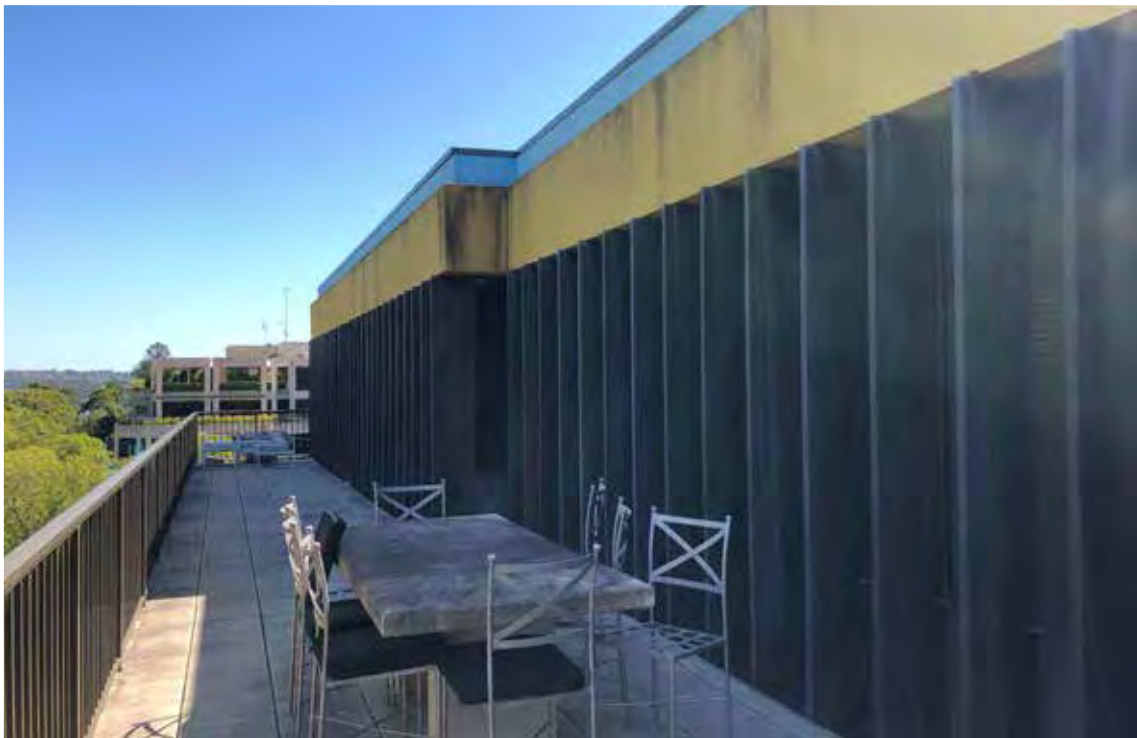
| The terrace. Instead of a terrazzo floor, it is paved with concrete pavers. The cantilevered roof was deleted from the design and thus the junction between the blades and the eaves is unappealing.
